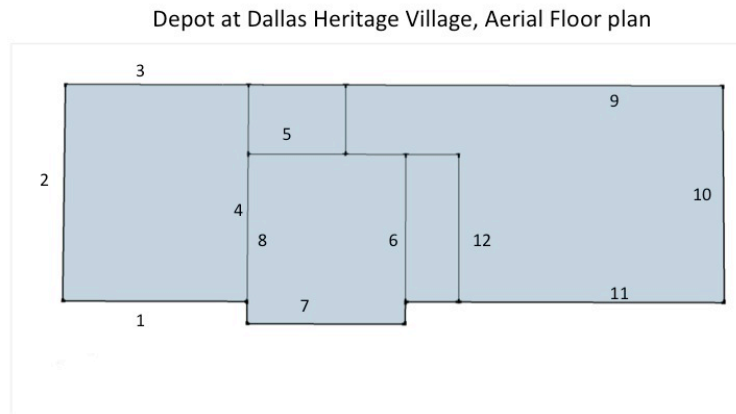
Aerial floor plan of the depot at Dallas Heritage Village with wall numbers as referenced in text
